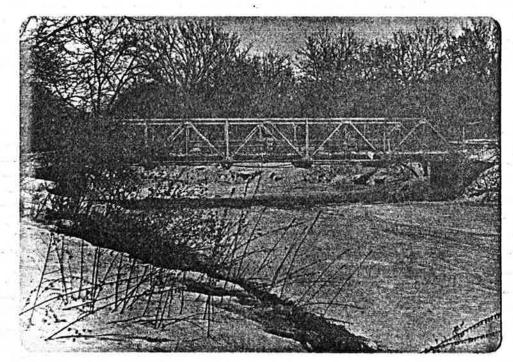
Kittson Avenue bridge in northwest Grafton. View of upstream side.
